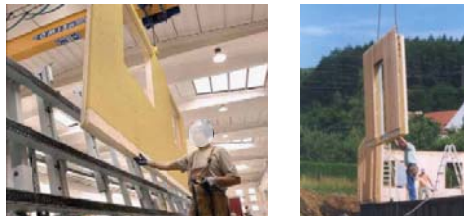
Example of prefabricated wooden panels during manufacturing phase (on the left) and installation on site (on the right, [source: Promolegno])
